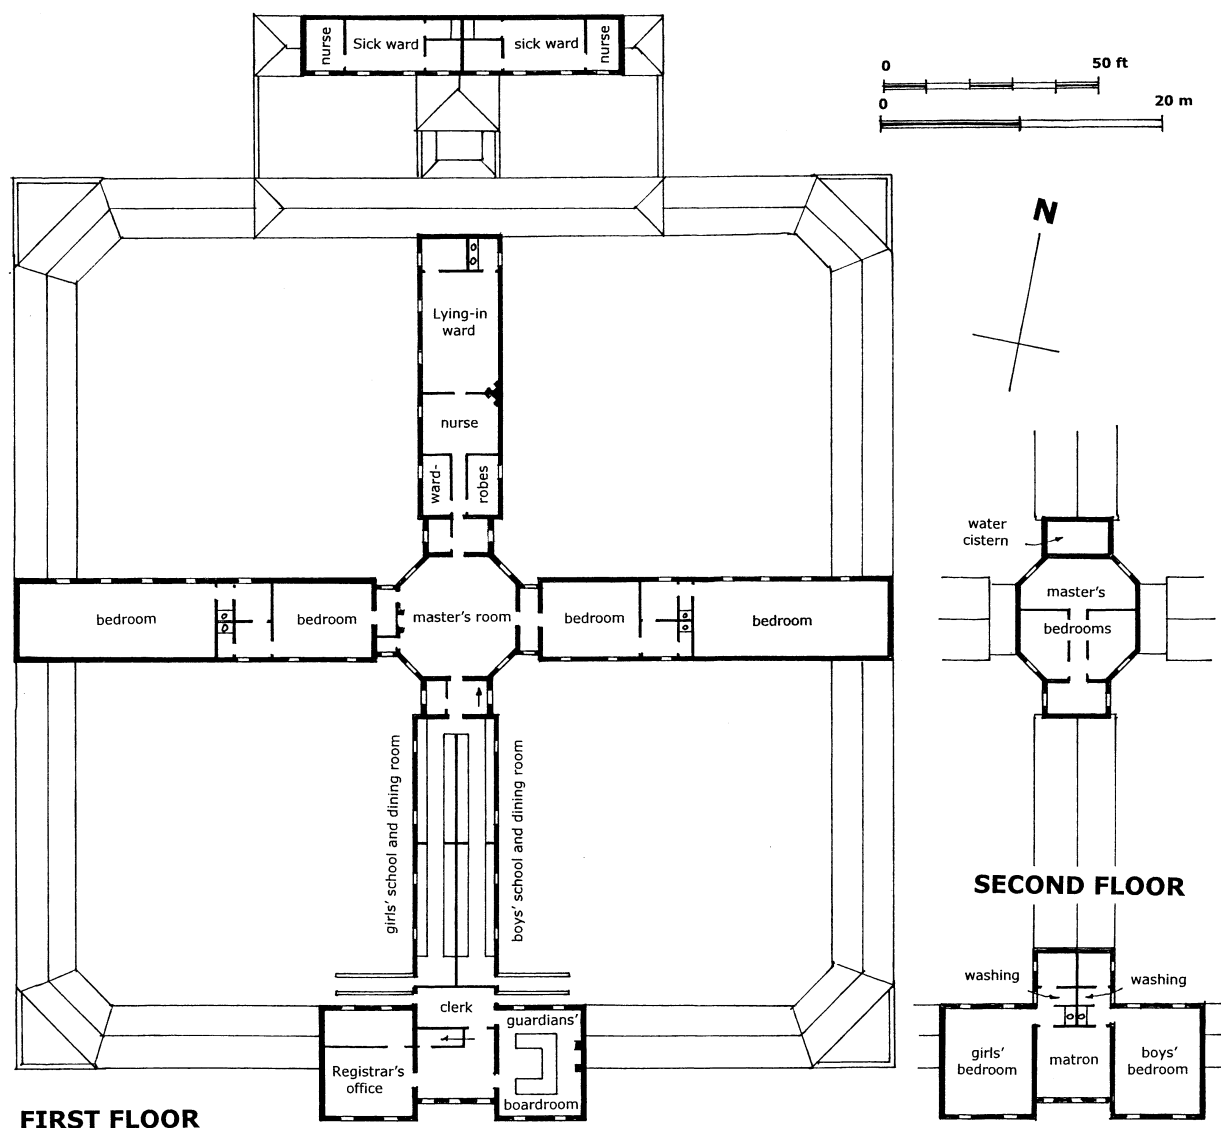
First and second floor plans of Ludlow union workhouse as originally designed in 1836. The partitioning of the governor's day rooms at first floor level at the centre of the building is not indicated. (After Stead's drawings: SA PL 9/9/2/1-4.)
